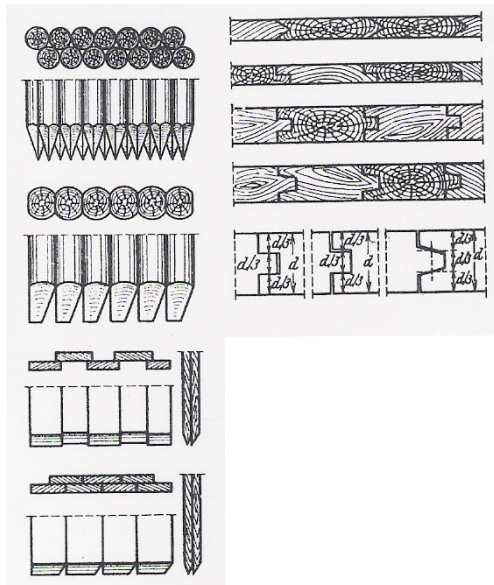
Sections showing the structure of early wooden sheet pile systems [Leimdorfer 1976]
